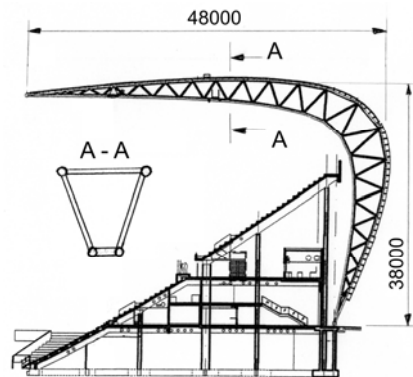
Roof carrying steel girder – diagram and cross section not to scale (description - see the text)
